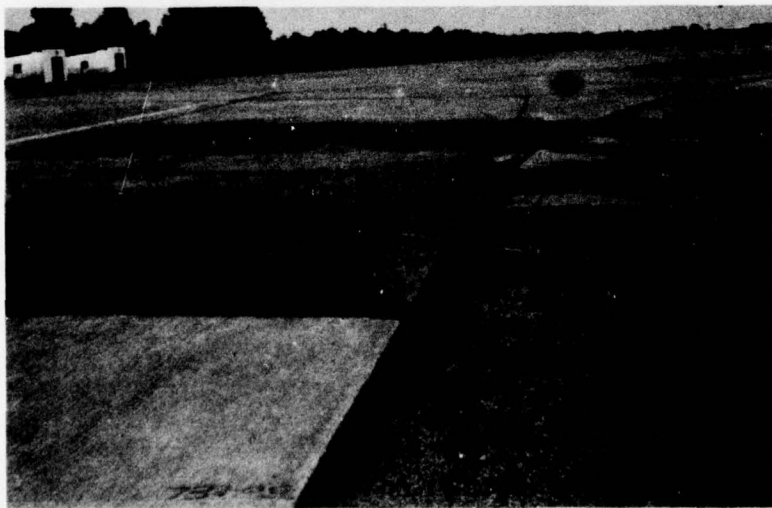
Alert taxiway; note water stains from seepage through pavement joints
